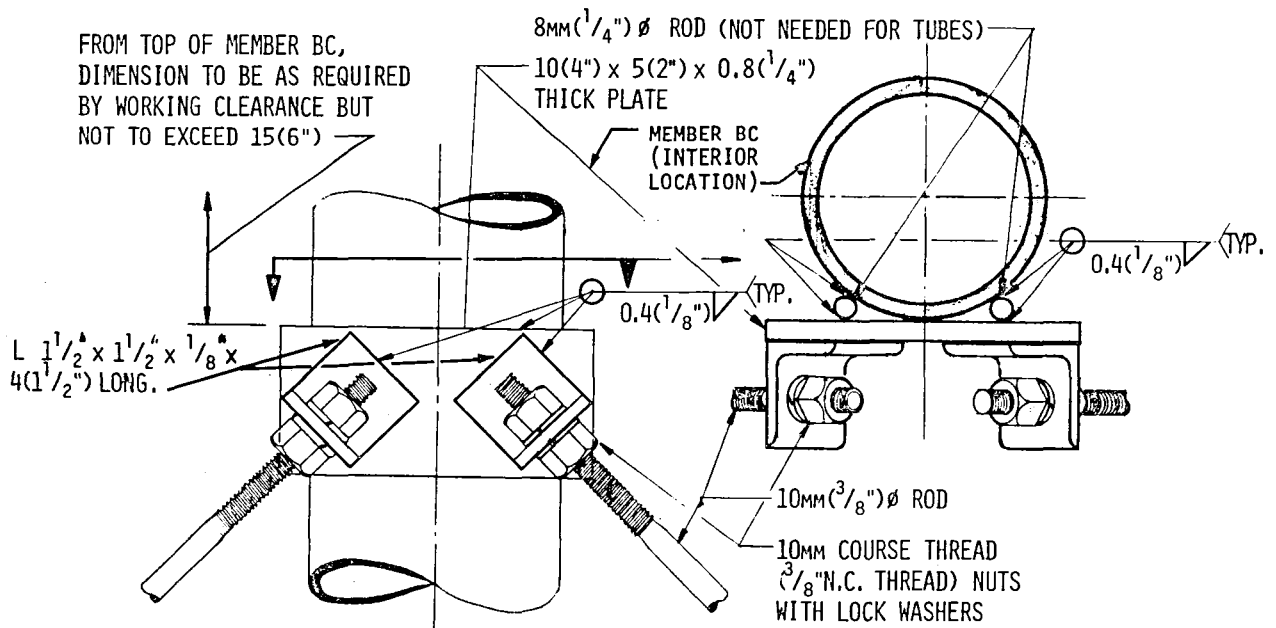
Diagonal Bracing Connection Detail Type 4 for Pipes and Tubes
